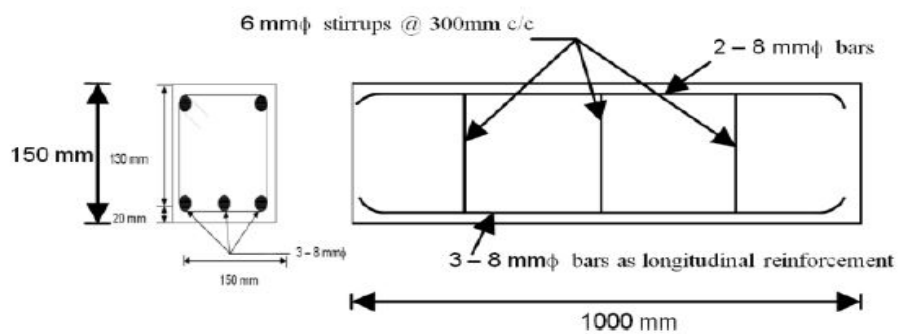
6: Reinforcement detailing (Anumol raju et al., 2013)
